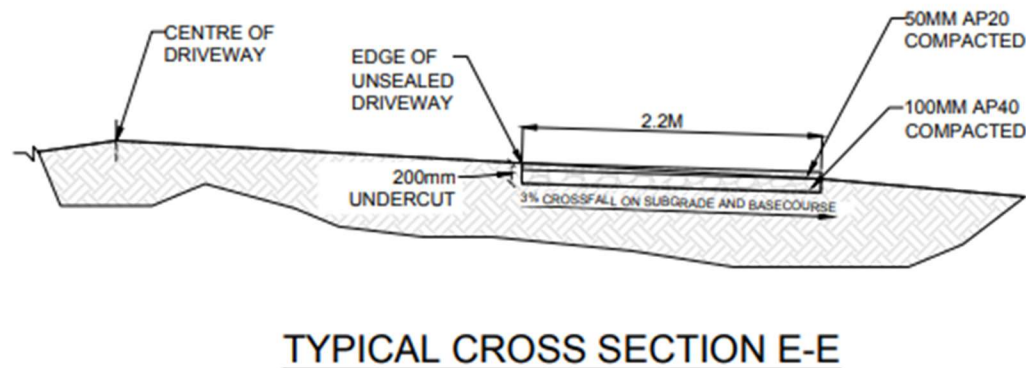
Earthworks to form walkway from Hoskin Civil Concept design drawing 13 of 13
